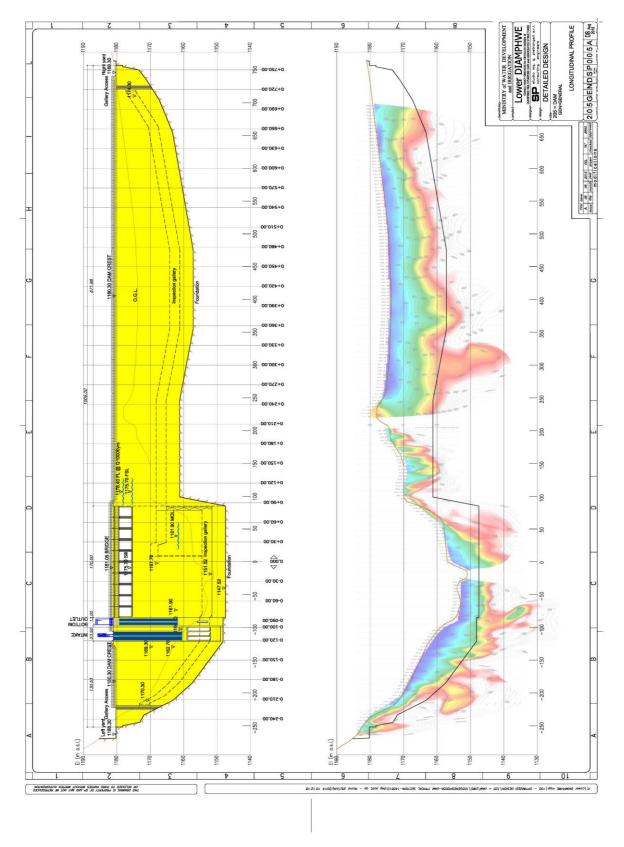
Dam Wall Longitudinal Section (Ref. SP 2015)
